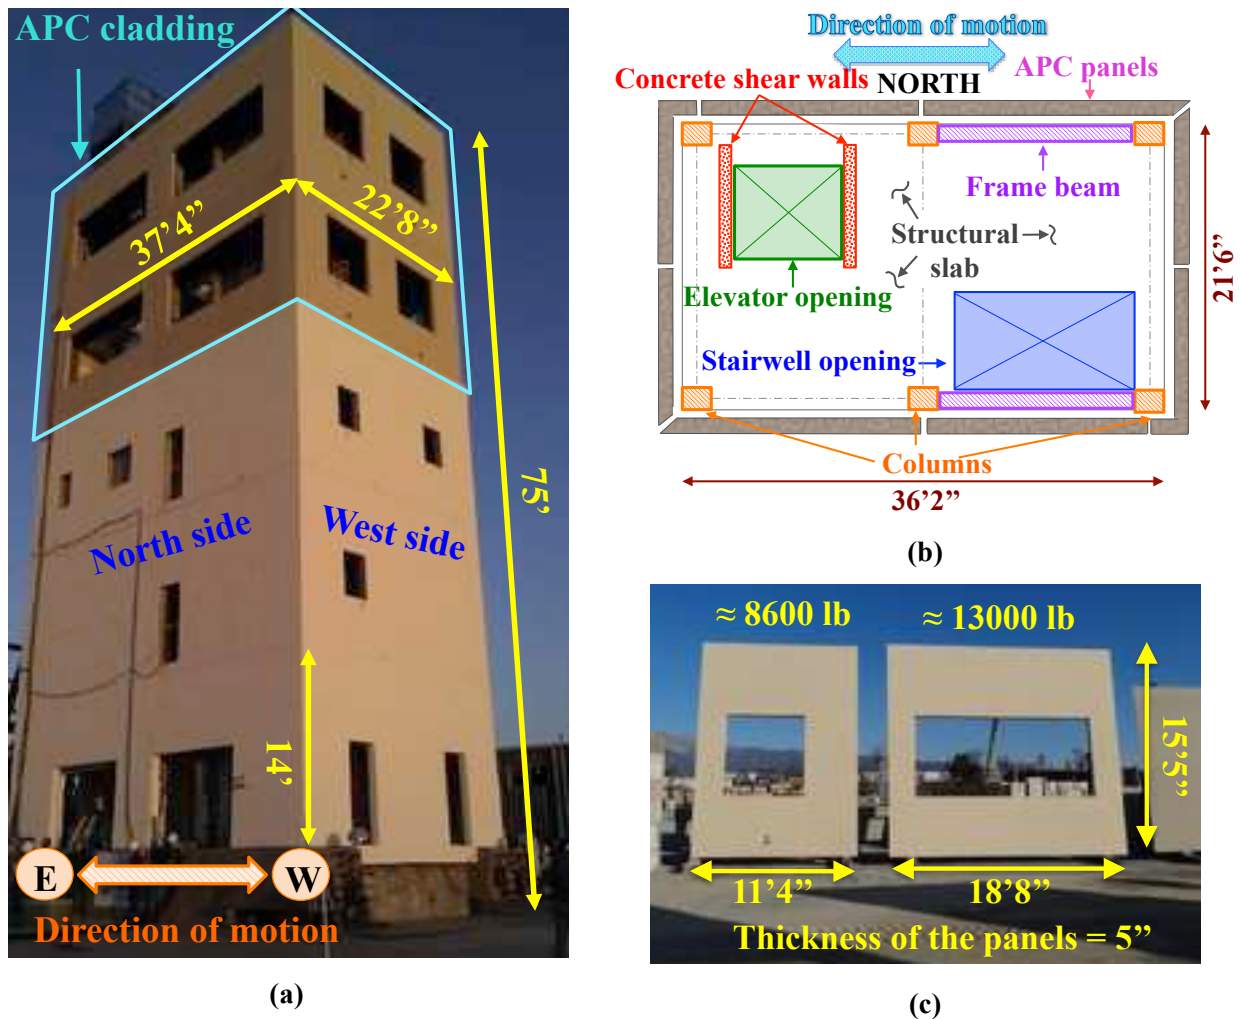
General views of the BNCS building specimen: (a) photograph of the North and West sides of the building, (b) plan view of a typical floor, and (c) images of the APC panels during fabrication at the precast plant.
